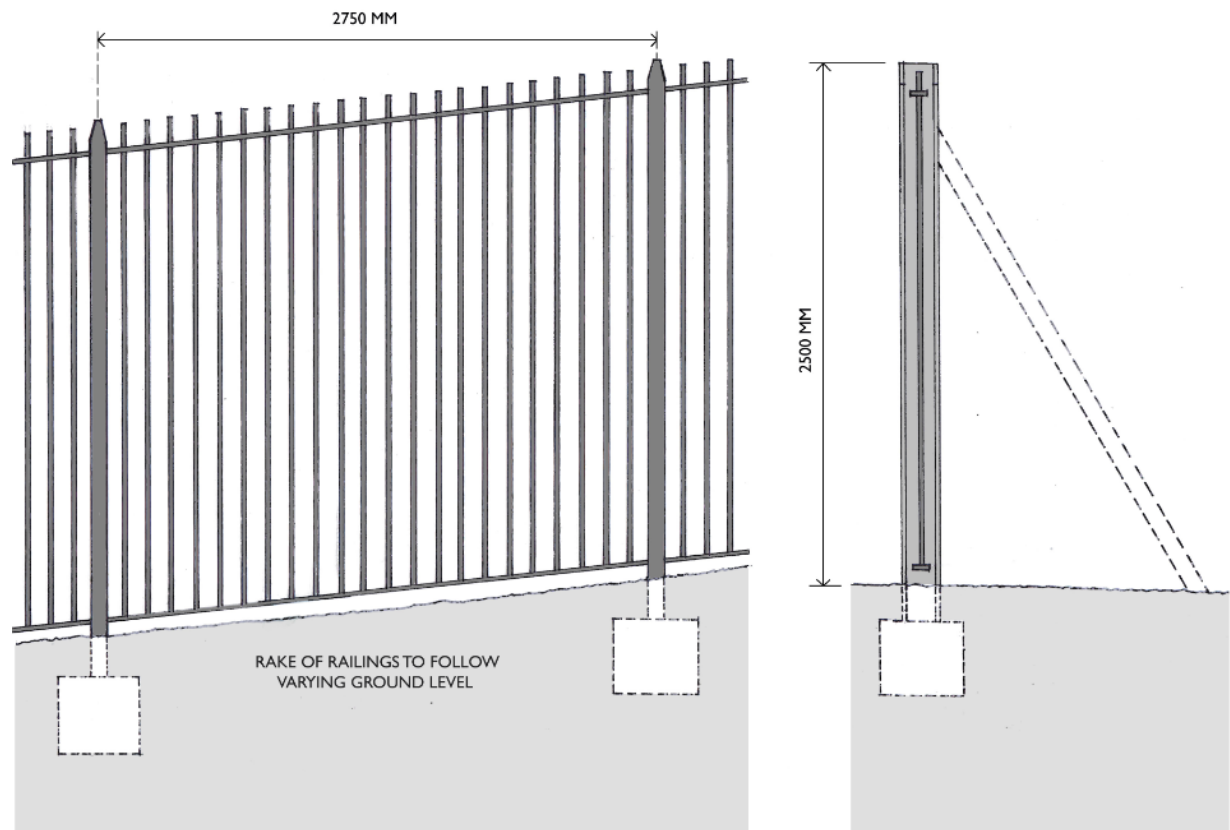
Typical bay elevation and section of proposed railings (not to scale)
